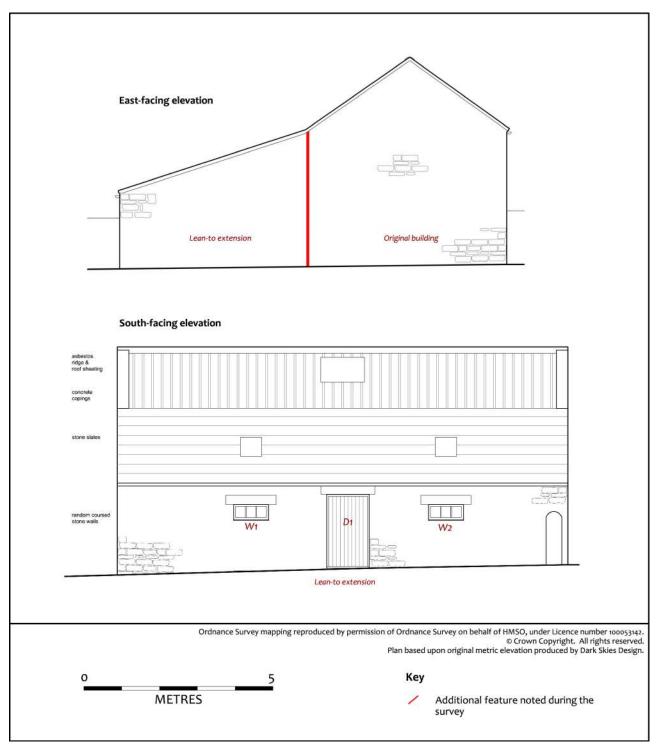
The east and south facing external elevations, based upon drawings by Dark Skies Design
